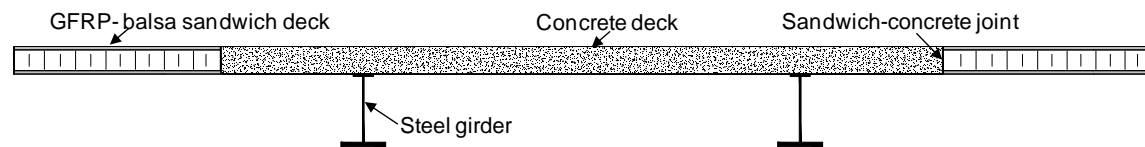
Concrete bridge widened with GFRP-balsa sandwich deck
